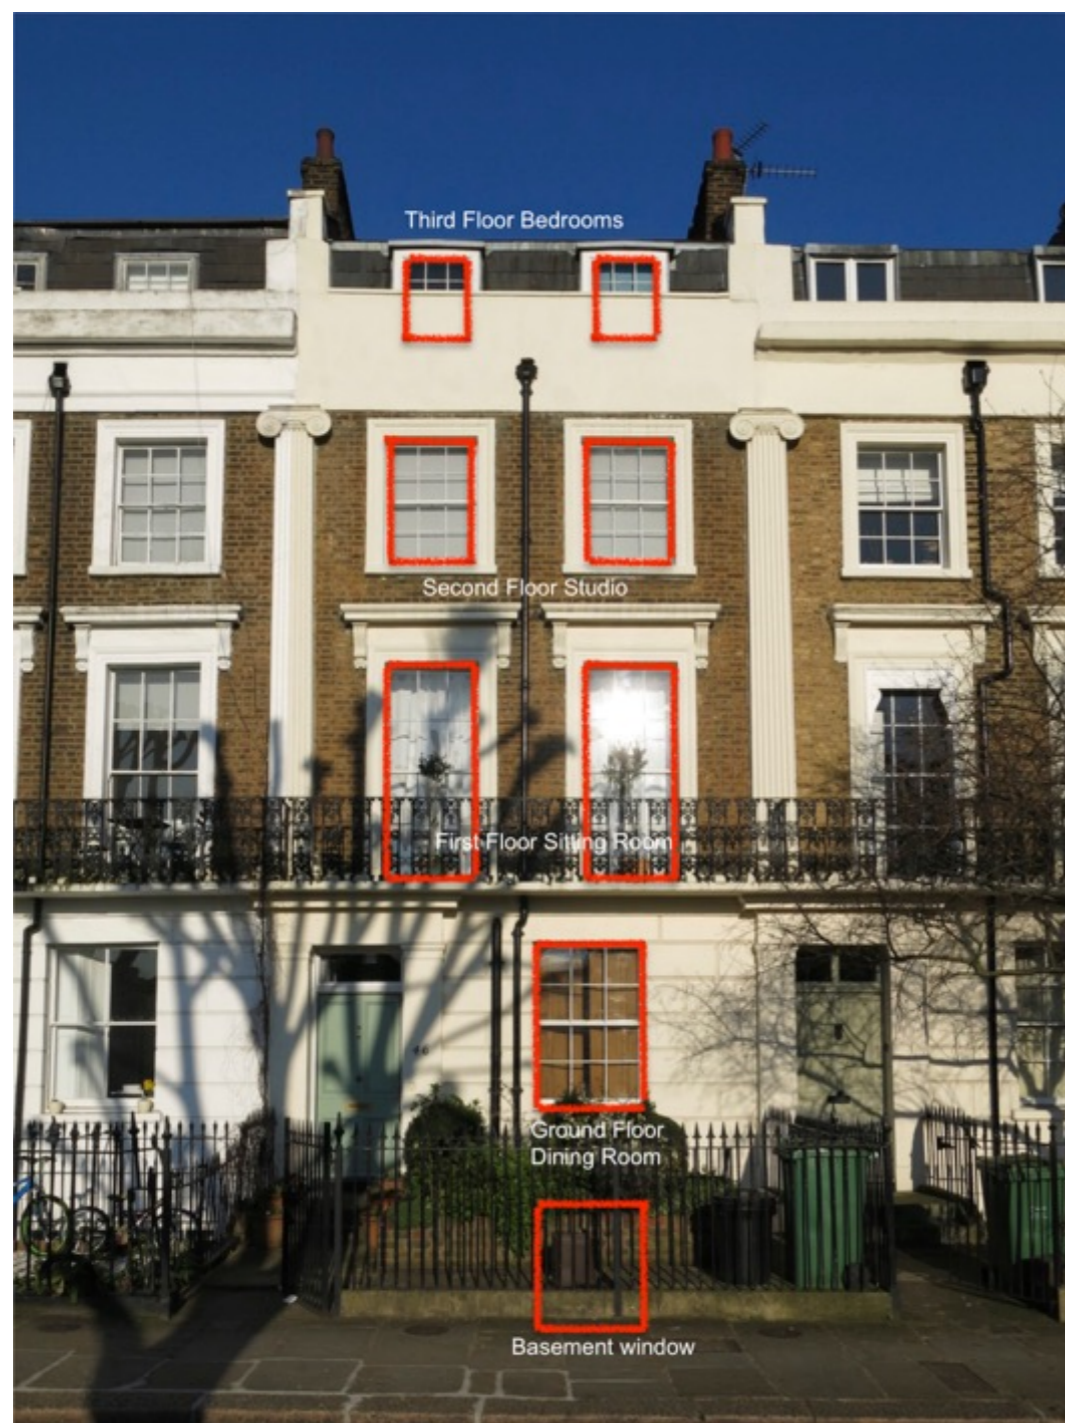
A view of the front elevation of 46 Mornington Terrace. Windows where internal secondary glazing will be installed are annotated in RED. The rear elevation was not accessible to take an external photograph.
